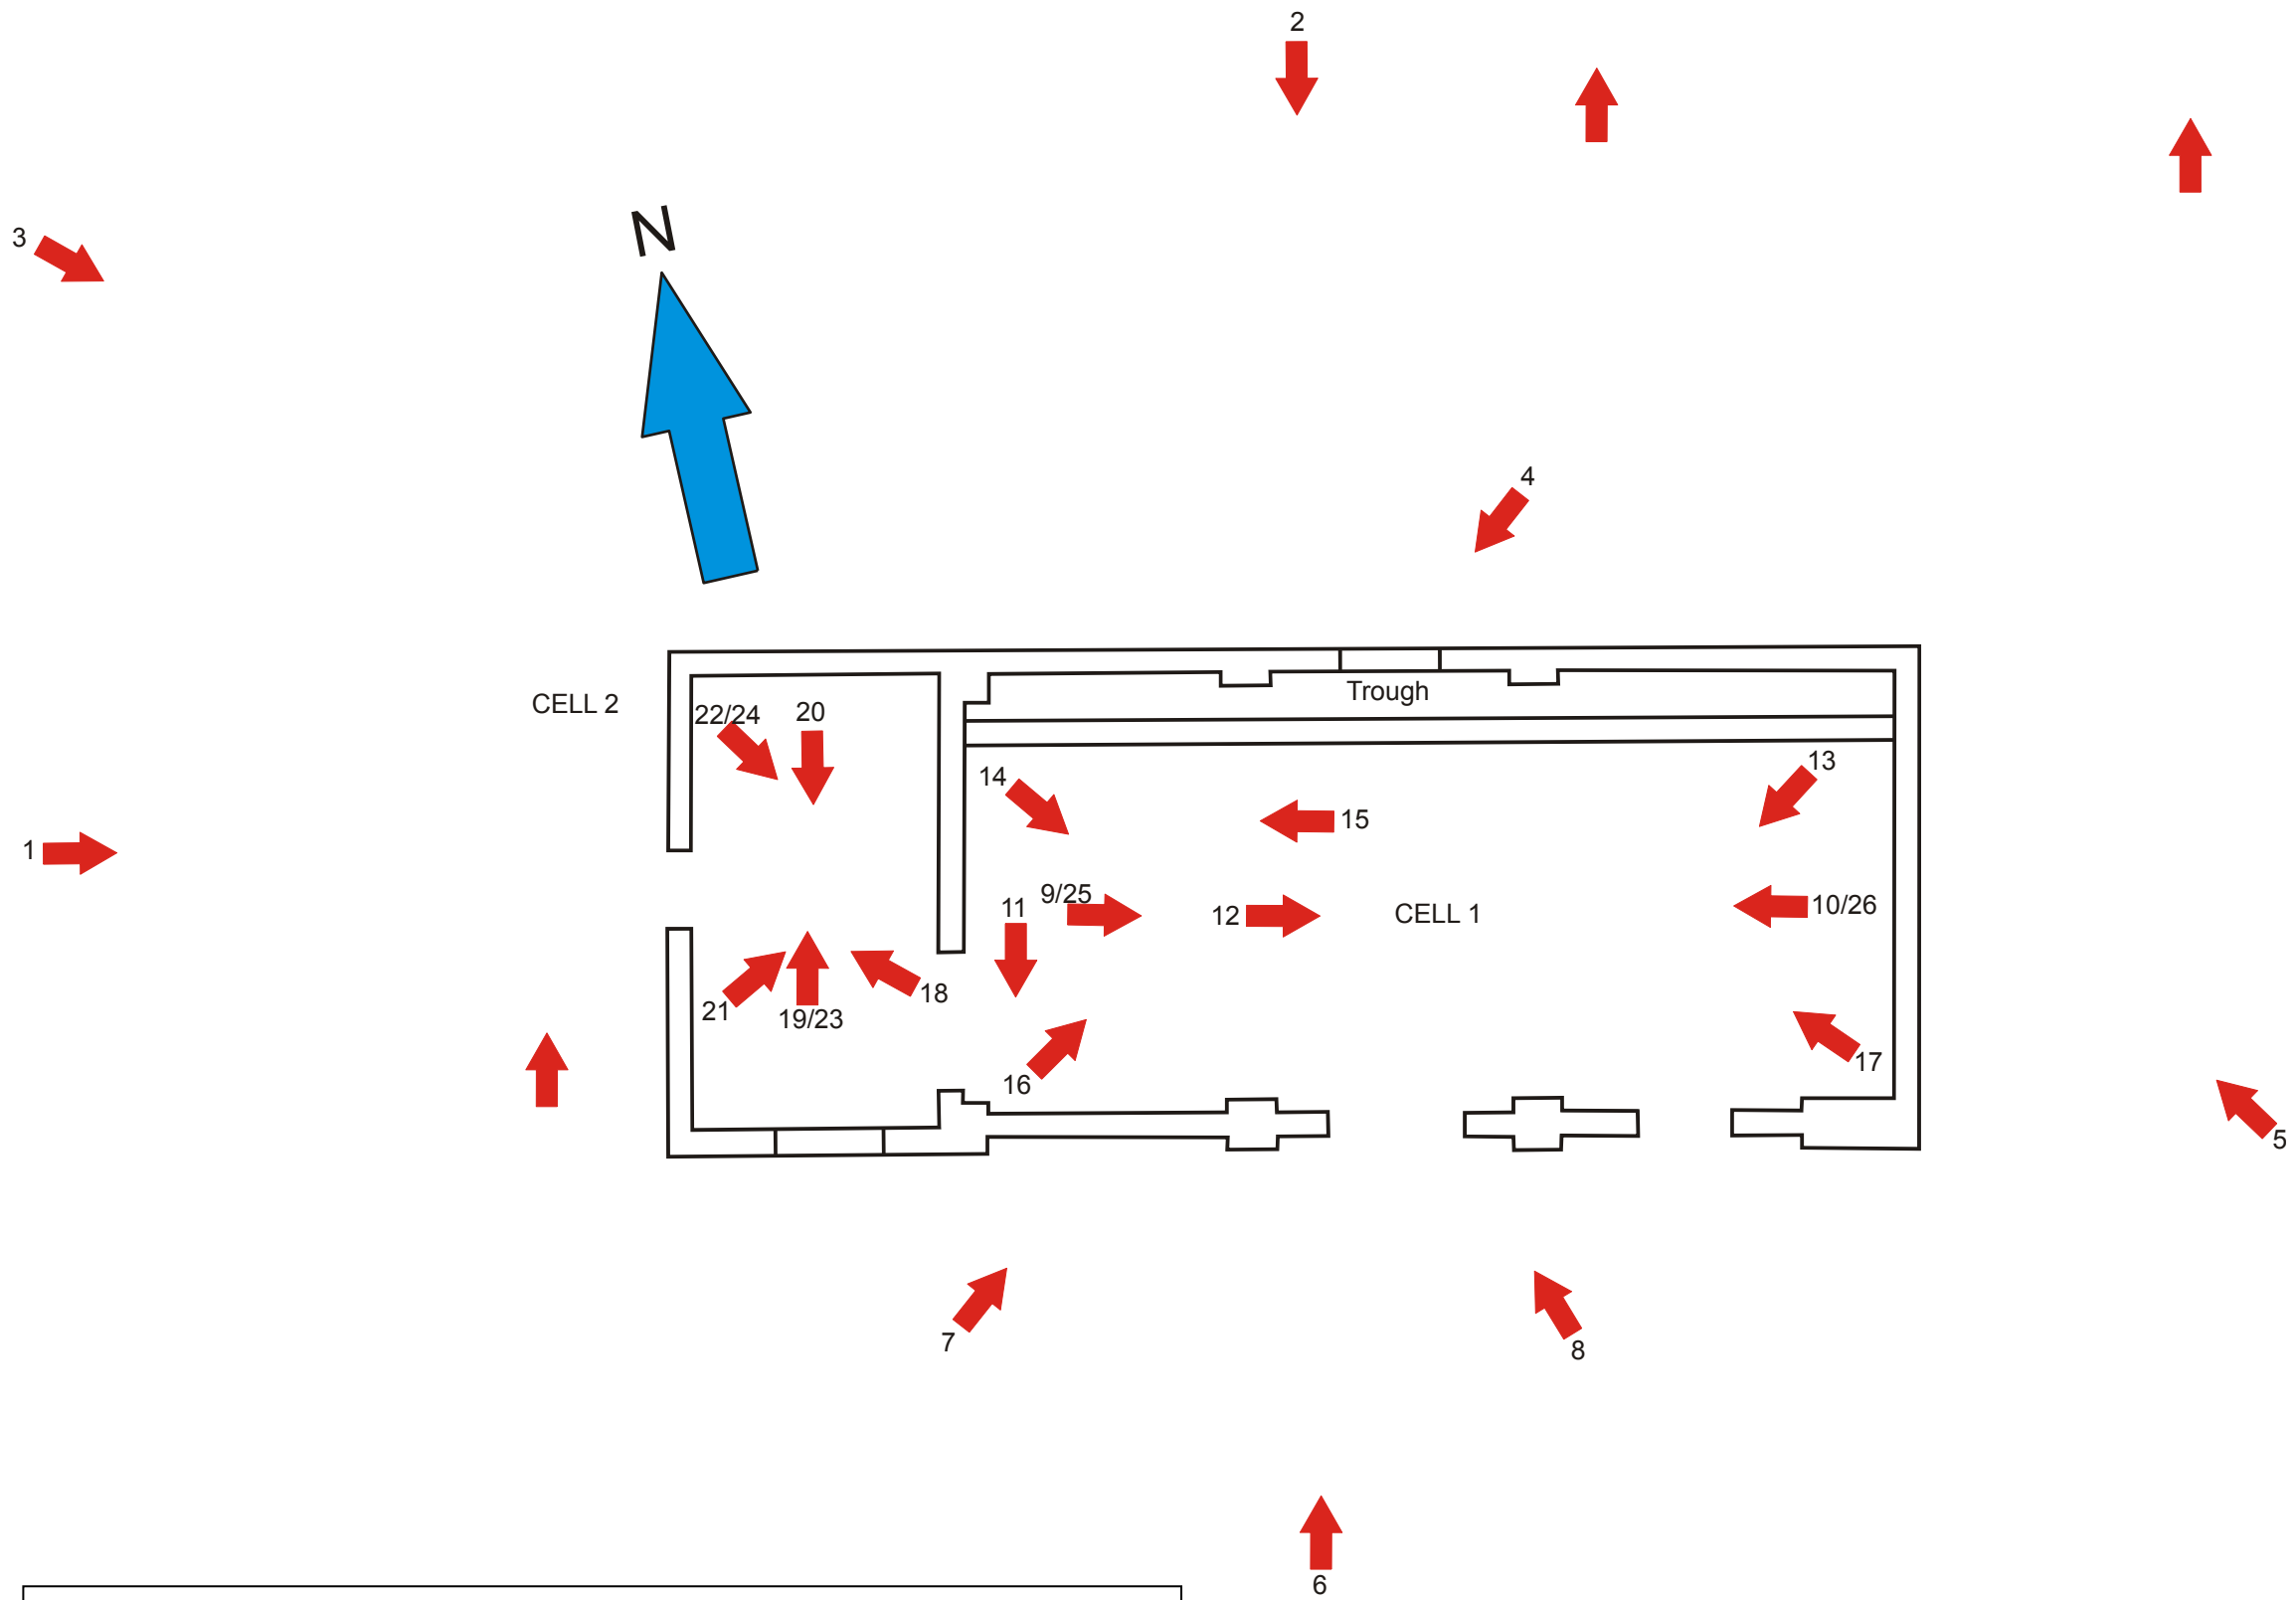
Ground plan showing the directions from which the site photographs were taken from at an original scale of 1:50 at A1, (not to scale), (extract from Architects plan).
